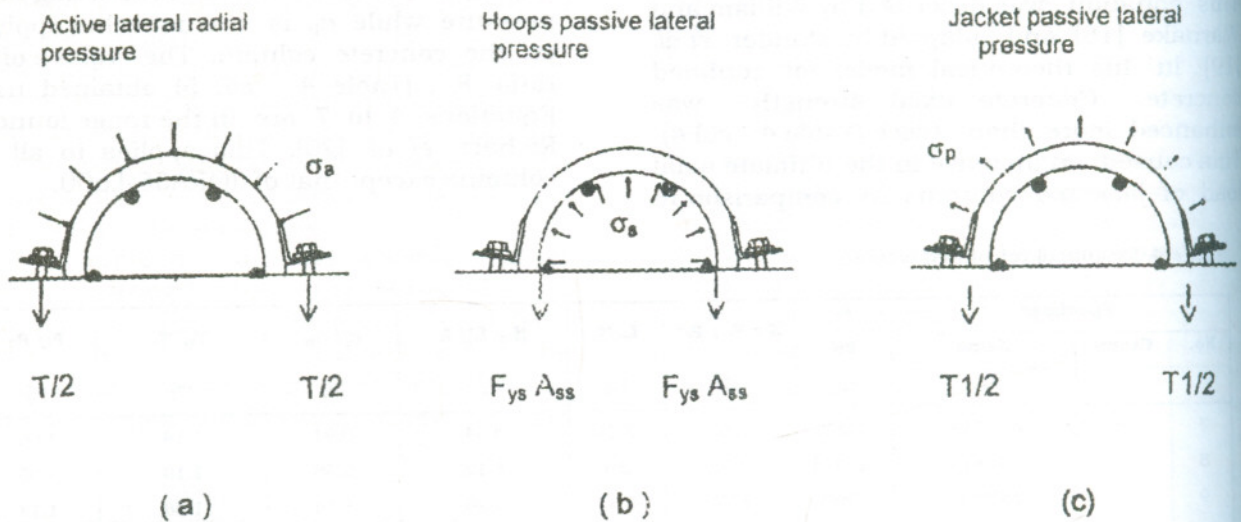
Confining action due to (a) bolts tightening, (b) hoops and (c) steel jacket.
